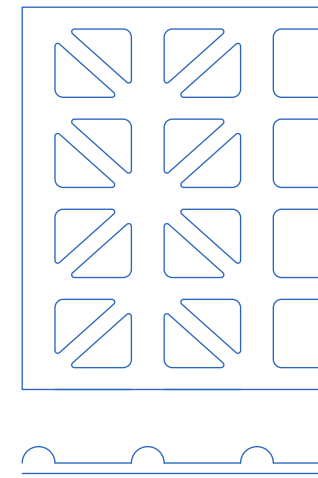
The sewing pattern. Below: At the horizontal beams one textile was folded in to form natural corners when filled.
